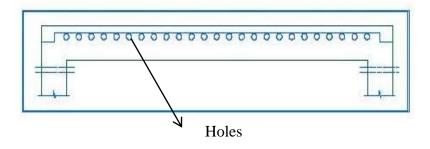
Beam section enlargement (The Constructor, Civil Engineering Home, 2013)
